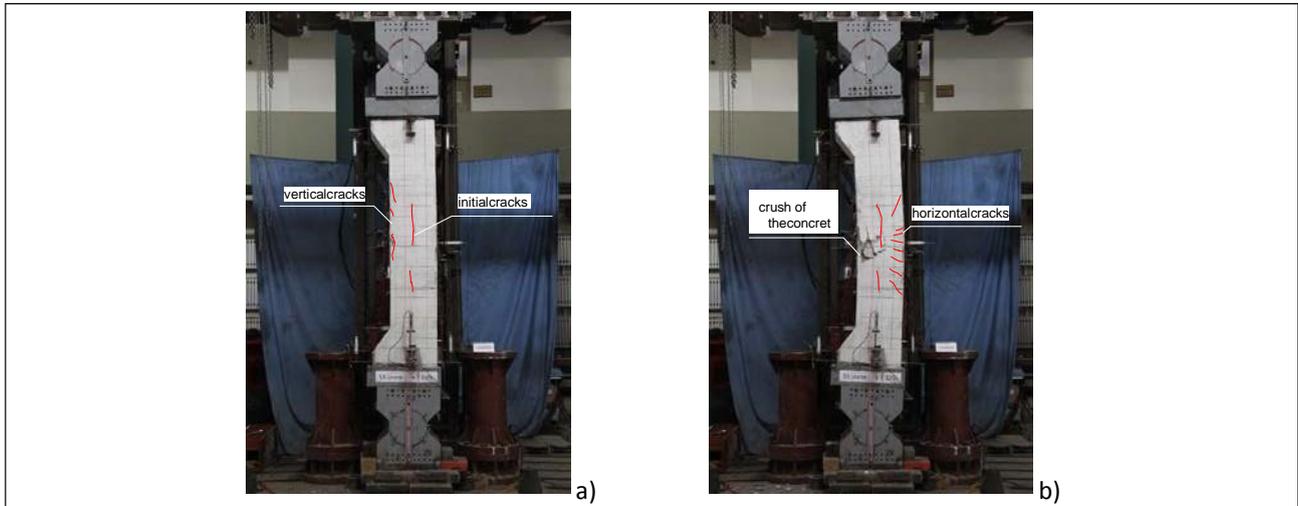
Crack development of specimens subjected to eccentric loads: a) 70% of the maximum load; b) failure load.”
